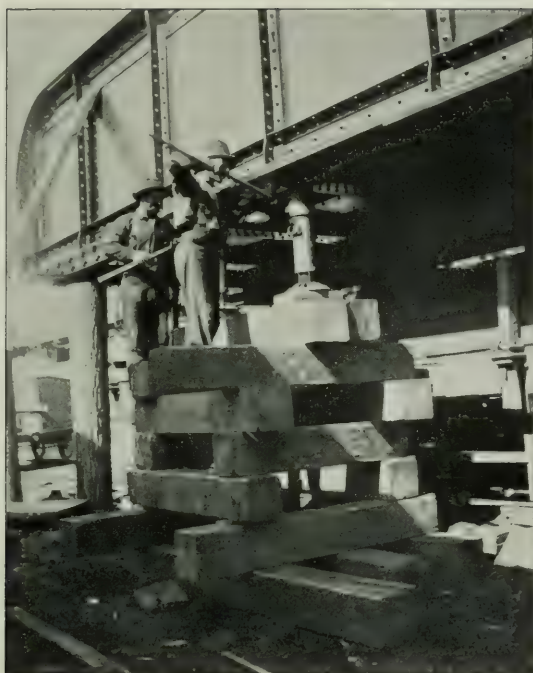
LOWERING BRIDGE SPAN ONTO PILE SUPPORTS.
